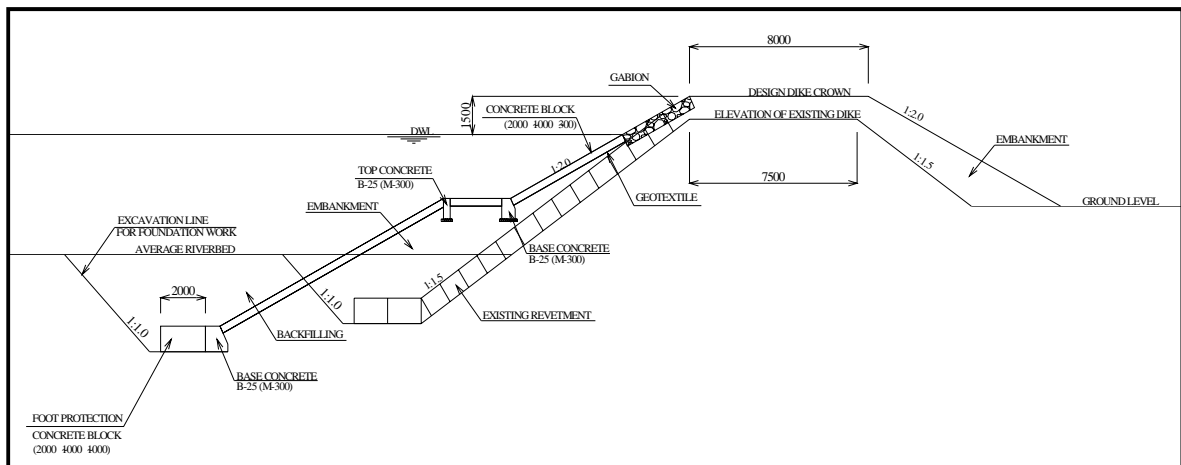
Typical cross-section and construction procedure of Dike
